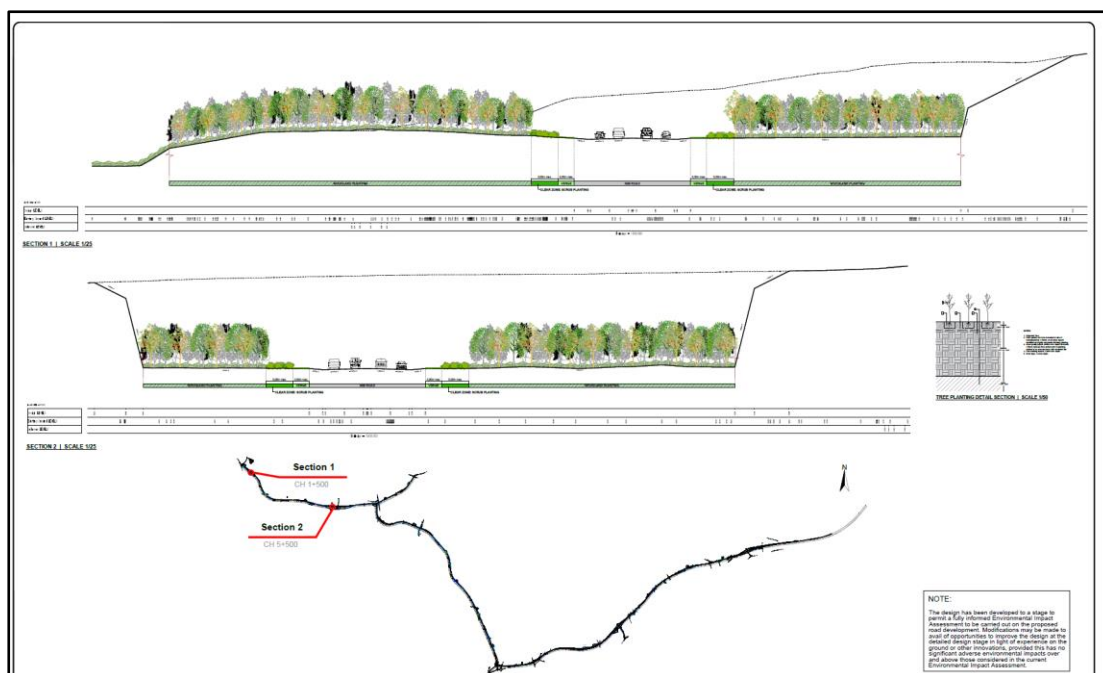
Typical Sections and Tree Planting Detail Section (taken from Figure R11 of the Further Information Request).
